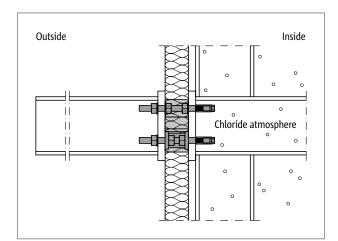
Schöck Isokorb® T type S with protective caps for cantilevered steel structure in an internal atmosphere containing chloride
